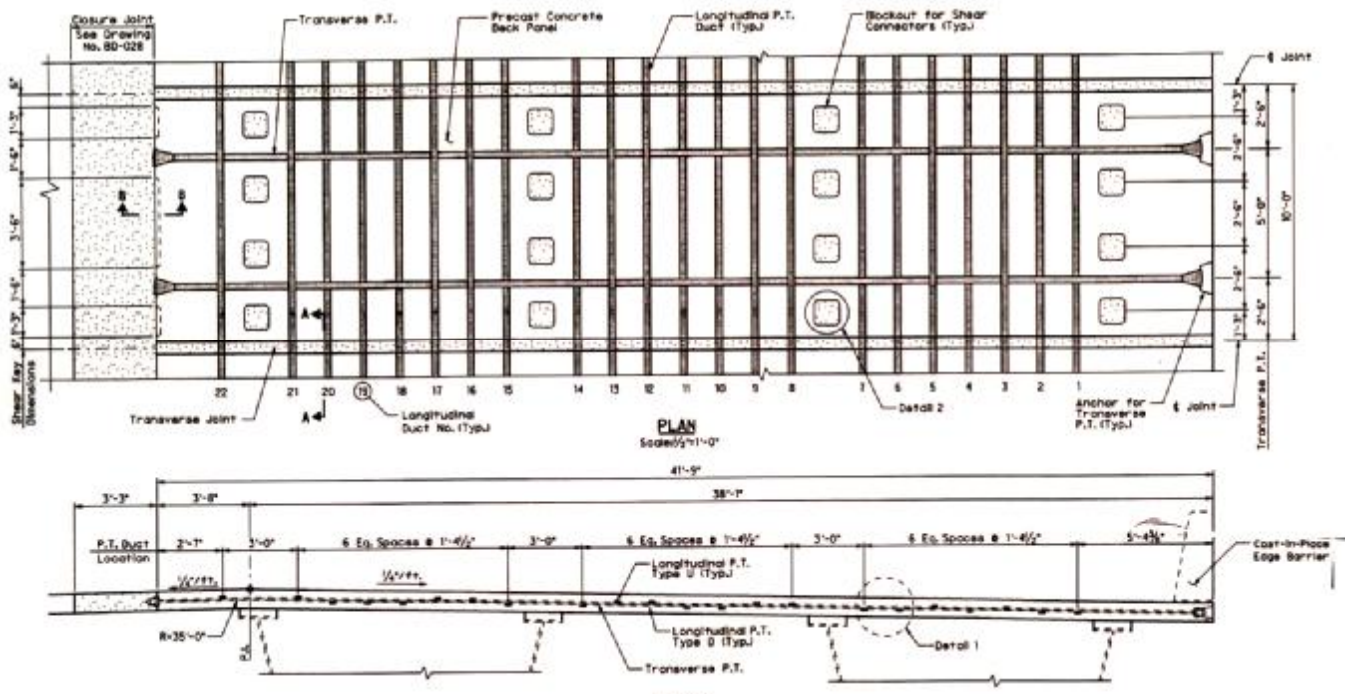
Details of Stage 1 of the precast panels
